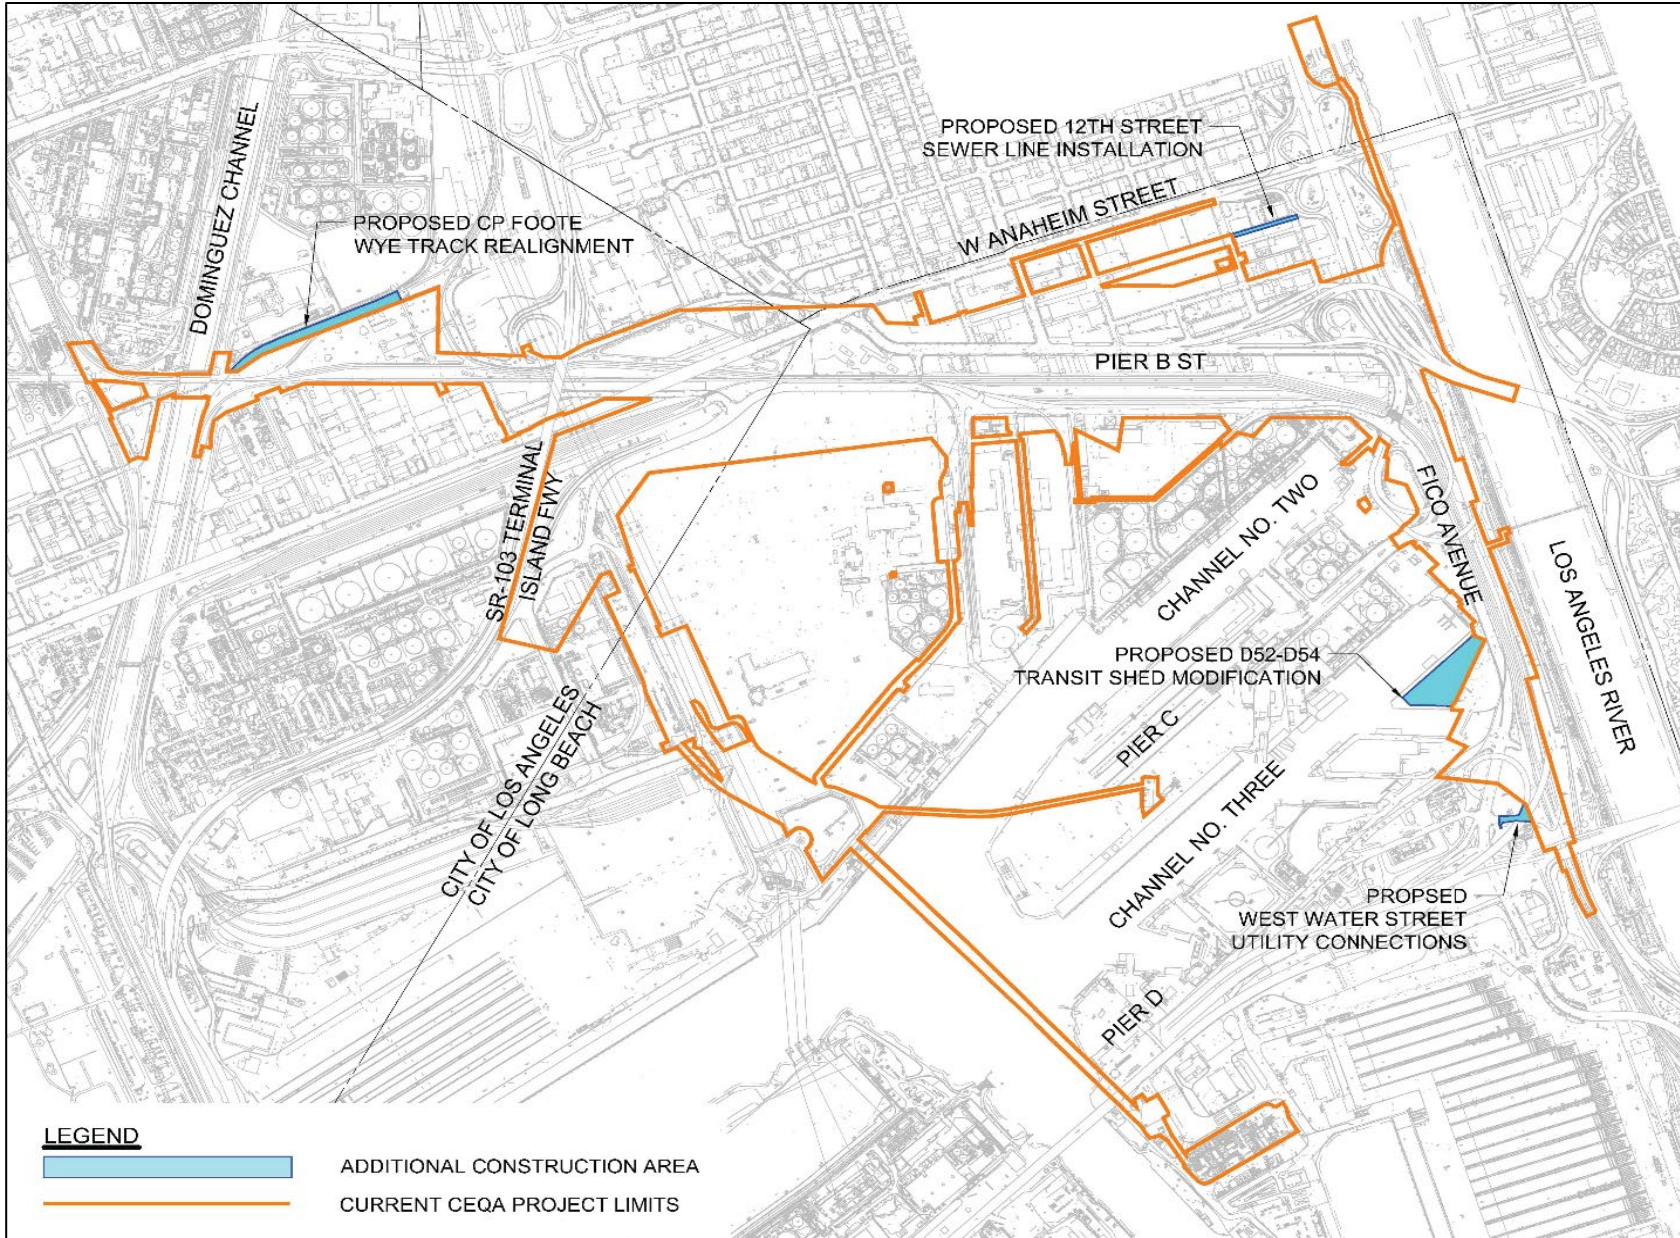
Proposed Additions to Pier B On-Dock Rail Support Facility Project
